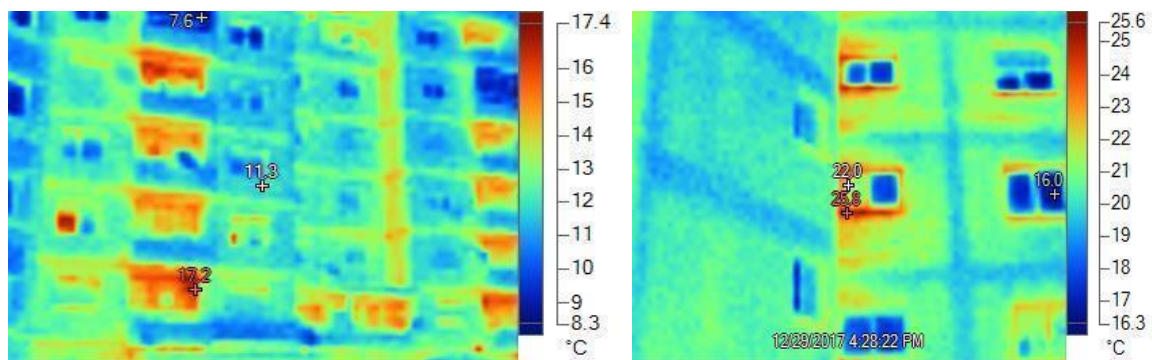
(a) Southeast elevation showing heat loss through the external wall, possibly due to insufficient building envelope insulation. Image taken 28/12/17 between 06:30 and 07:54 a.m. (b) Southeast elevation showing significant heat loss through windows and heat loss through wall junctions and cracks on building surface. Image taken 28/12/17 between 16:30 and 17:45 p.m.
